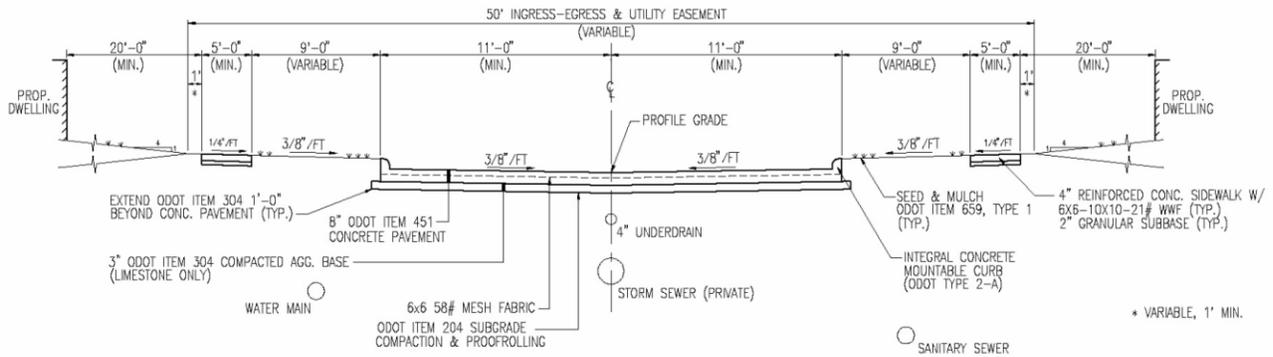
TYPICAL PRIVATE DRIVE SECTION (CONCRETE W/ CURB)
